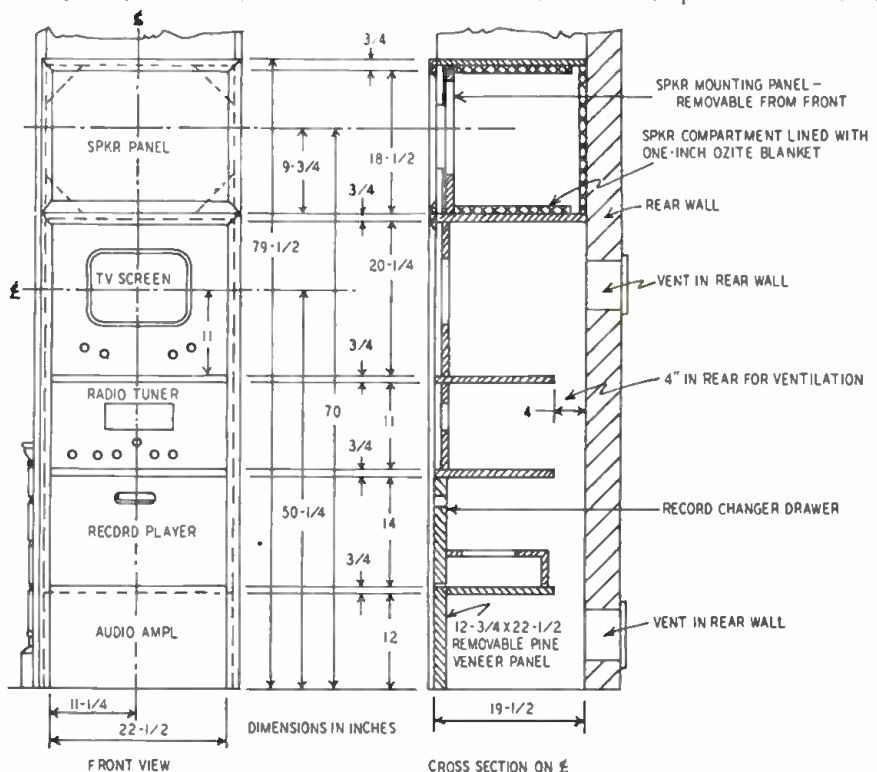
A front-panel view and cross-section of the installation in Fig. 1.
